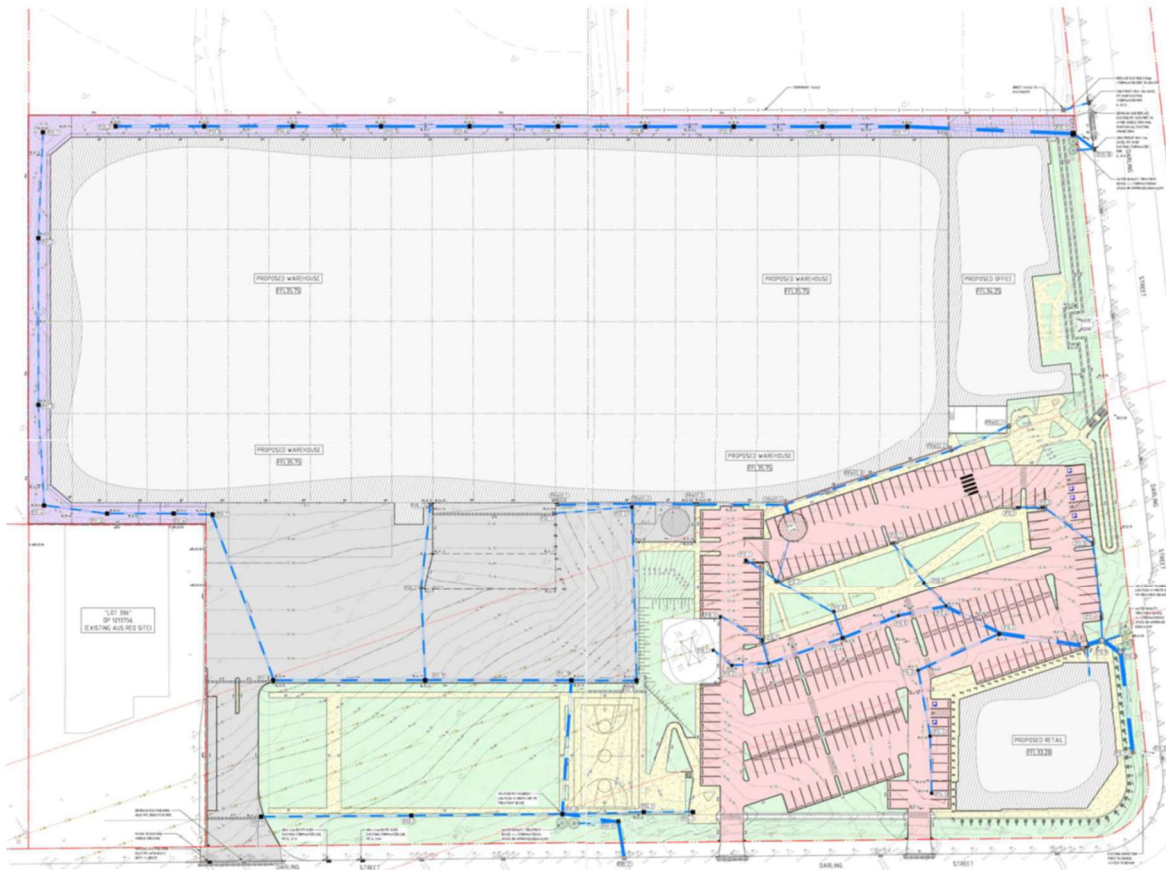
Concept Stormwater Management Plan (Source: Northrop)
